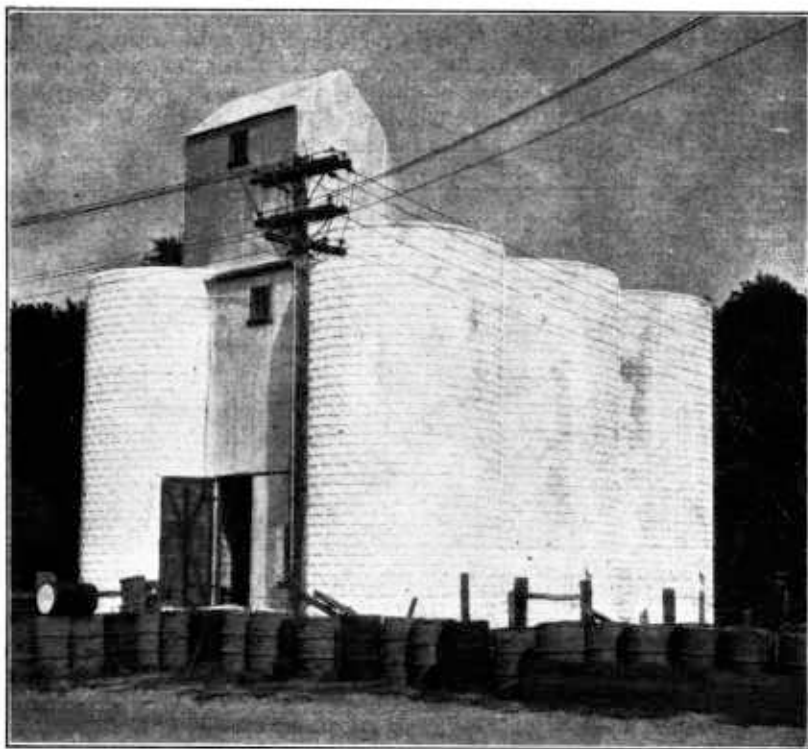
A new farm granary built of concrete blocks which have been painted with a waterproofing paint
